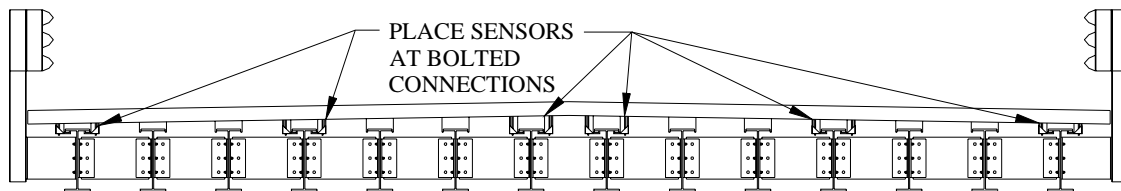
Section 2 of the Instrumentation Plan/Layout
